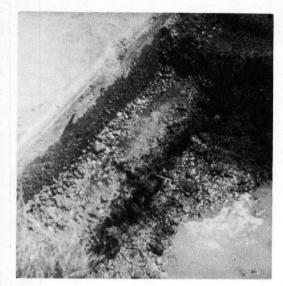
A continuation of the investigation at Station 260+33. At this stage part of the clay dam and granular wall filling the cavity has been removed allowing the water to drain from under the pavement. Note opening under pavement edge where water flowing from beneath the pavement has broken the wall of granular material.
